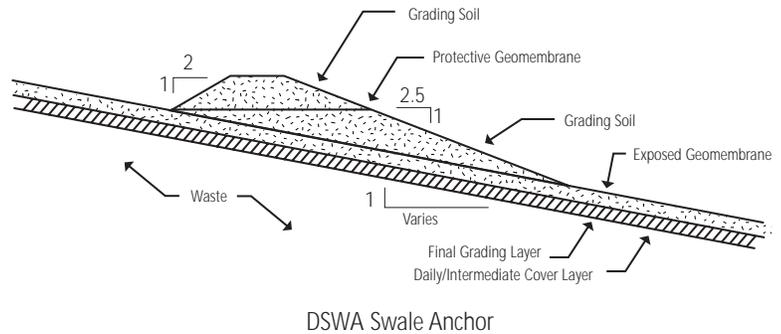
Detail of swale bench anchor used at the Delaware Solid Waste Authority EGC project.
